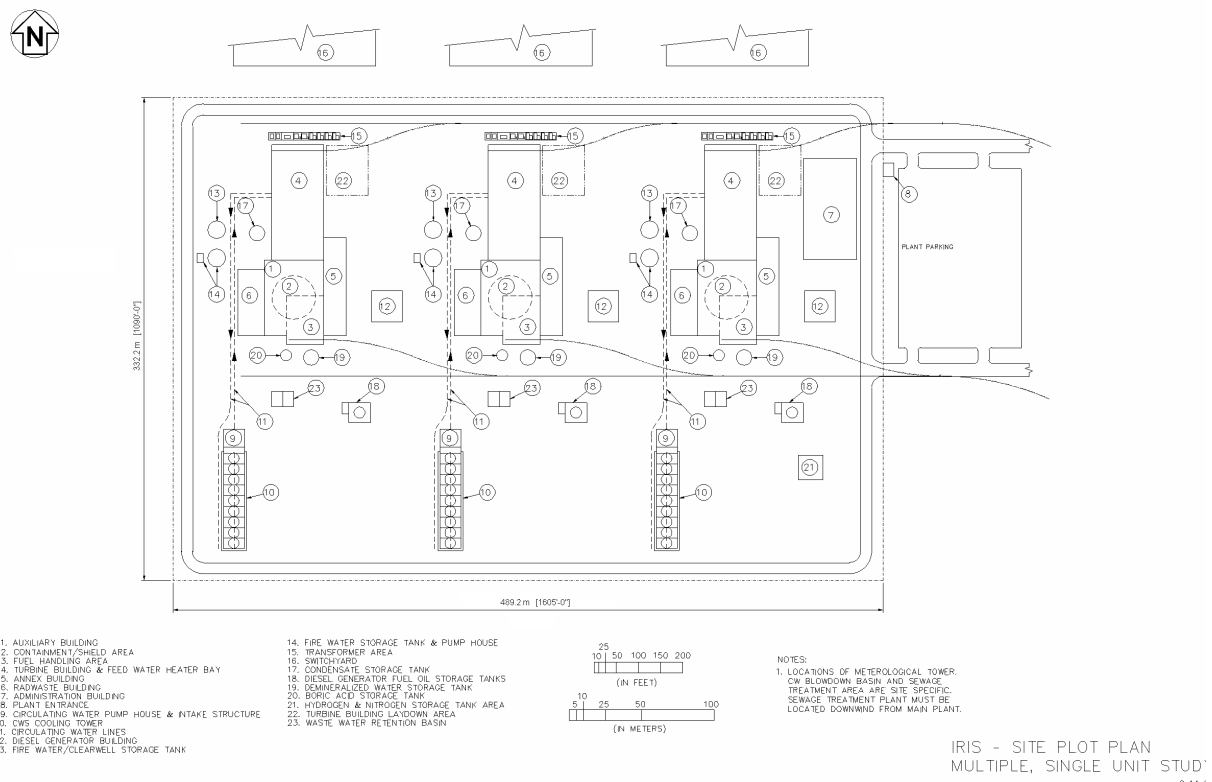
IRIS, Three Single Unit Site Plot Plan.
